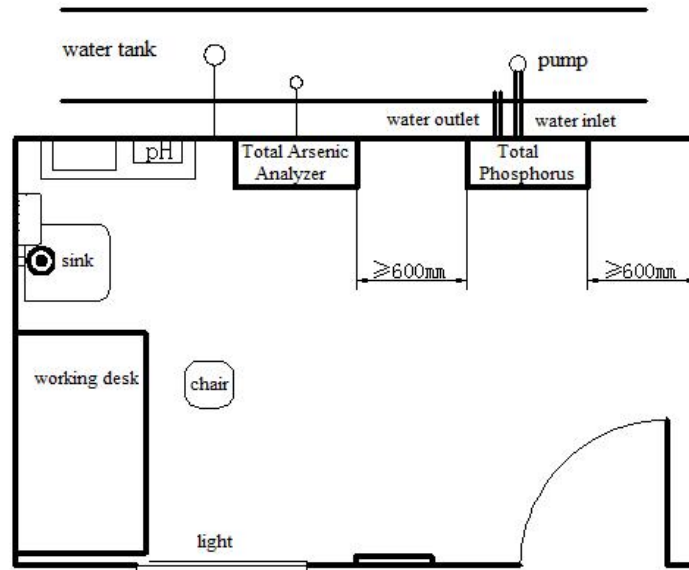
Workstation installation (recommended) plane sketch diagram
